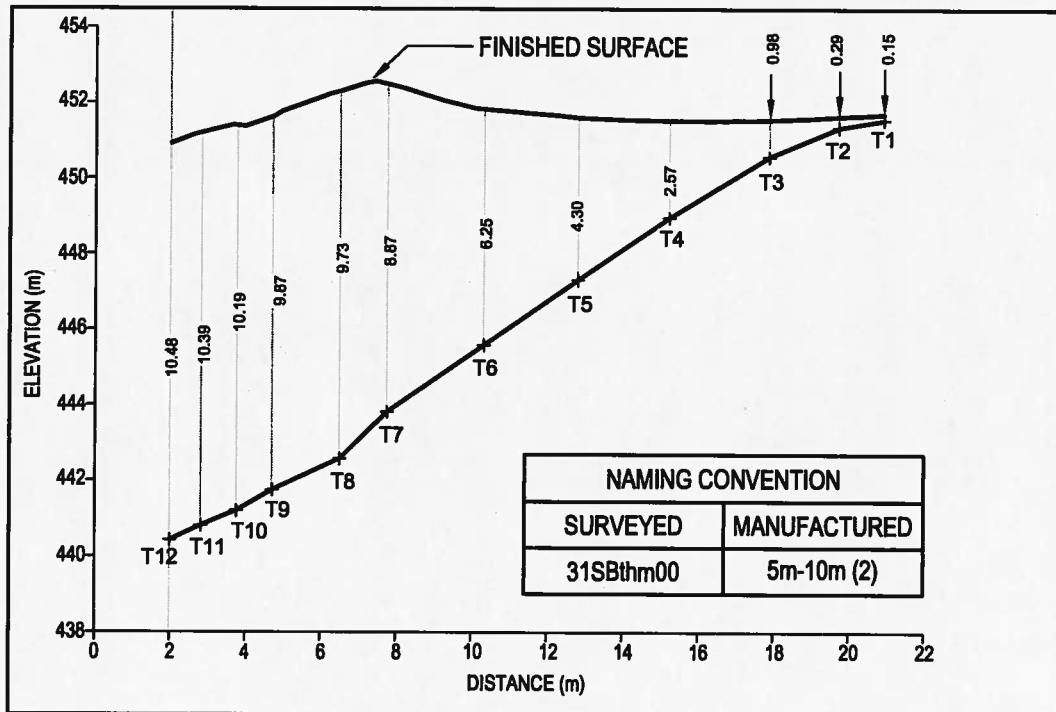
31SBthm00 (5m-10m (2)) - AS MANUFACTURED, PLAN, AND SECTION
